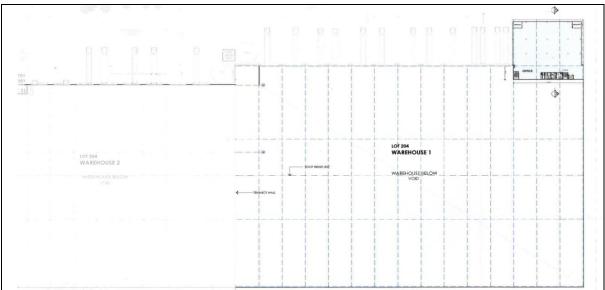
Extract of the approved Floor Plan of Warehouse 1 under DA-594/2013
